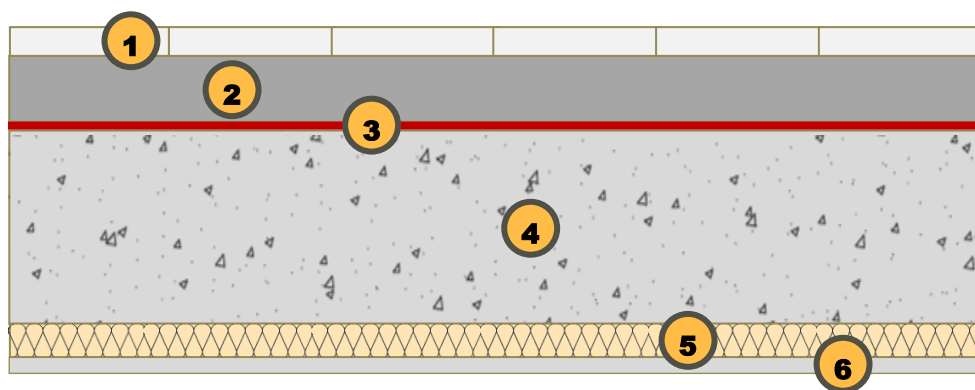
Construction detail for insulated (rigid insulation board – extruded polystyrene) slab - under deck
